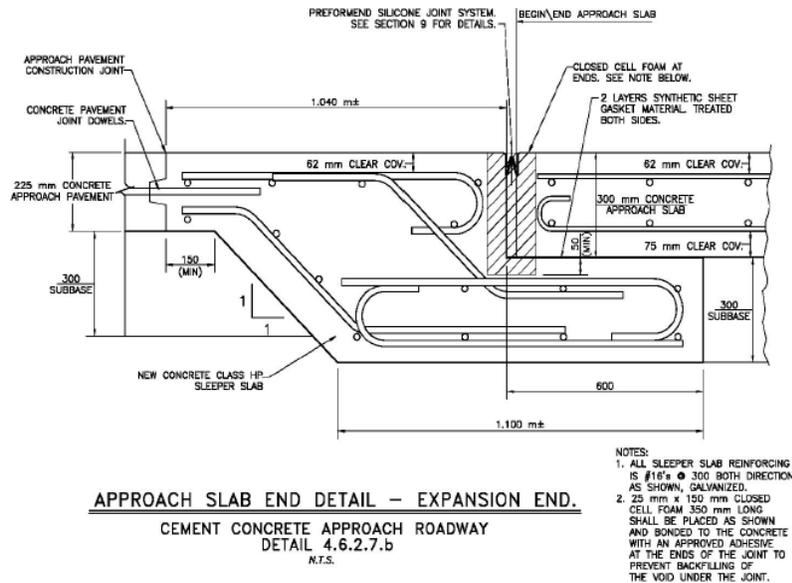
Sleeper slab with concrete pavement approach. (New York DOT)
